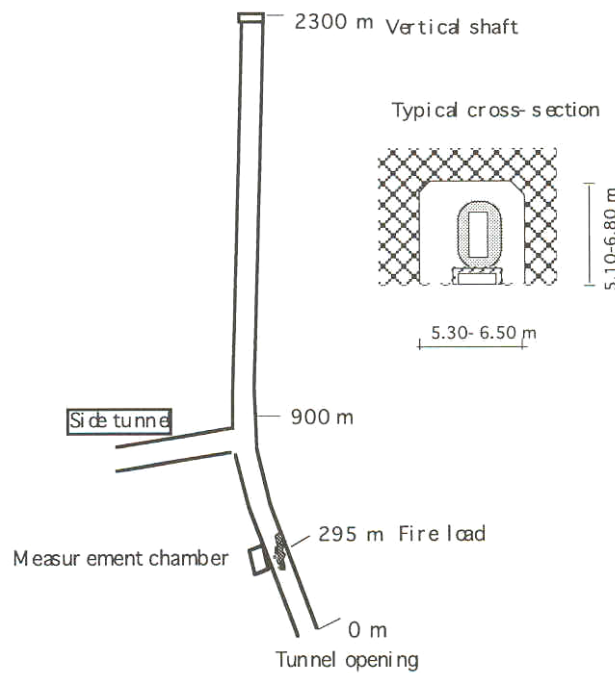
Layout and typical cross-section of the tunnel (reproduced from Ingason et al. (1994))
